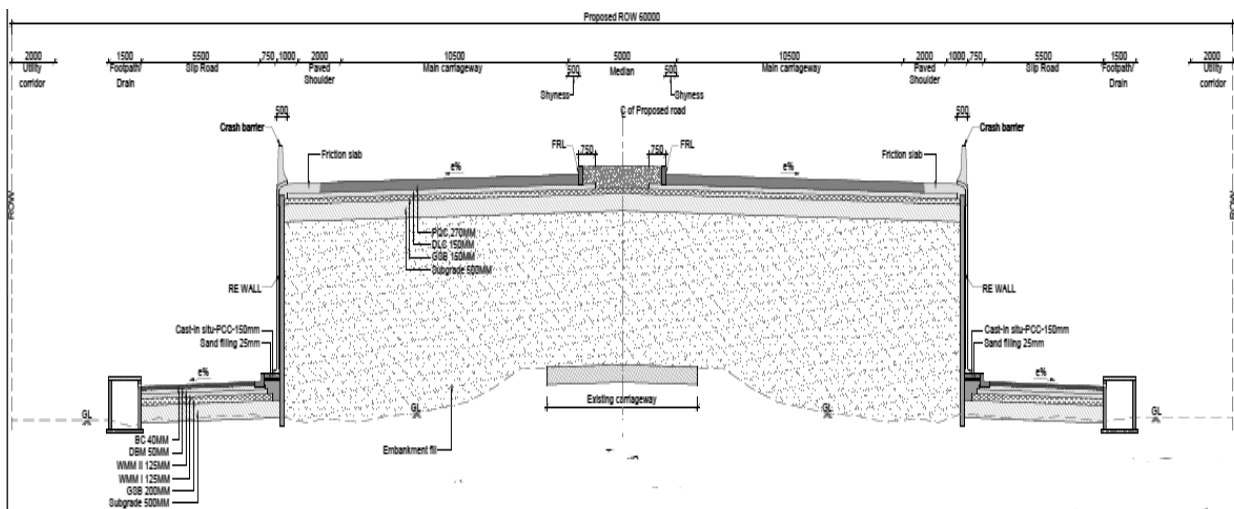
TCS-6A Typical Four Lane Underpass Cross Section with Slip Roads in the Existing Road
